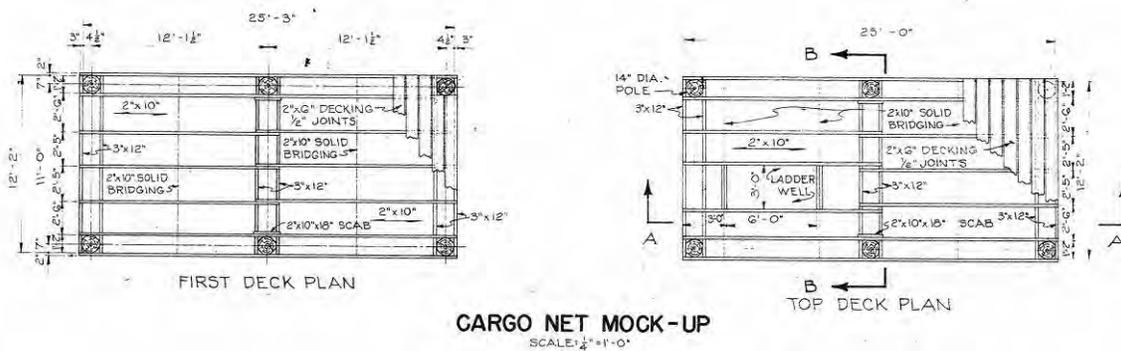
Cargo net mock-up, first deck and top deck plans, Fort Bragg, NC, 1952 (standard drawing 28-13-32 sheet 1 of 2; cargo net mock up, plans and details; 1 April 1952).
